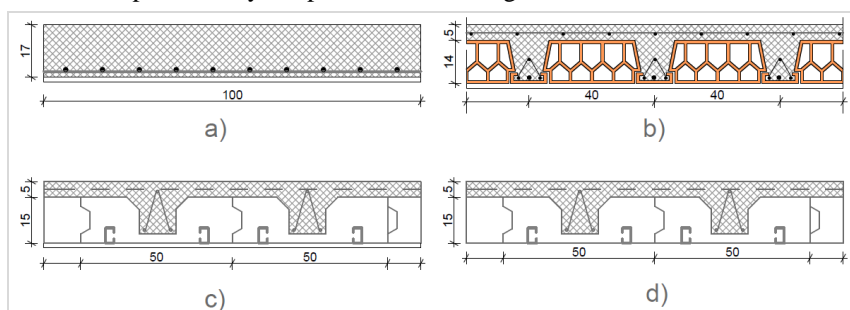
Different types of floor structures: a) RC slab; b) slab system FERT; c) slab system STIRODOM with plasterboard as thermal insulation; d) slab system STIRODOM
